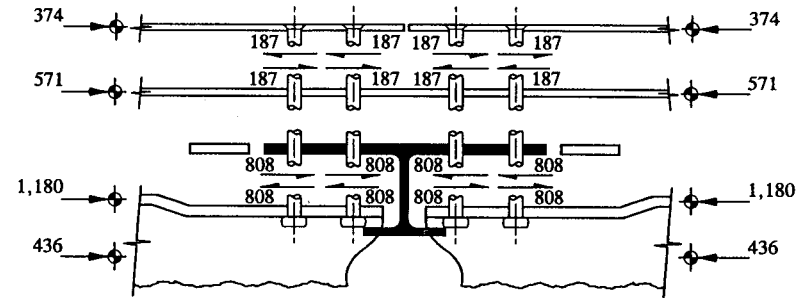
Transfer of shear through the end fasteners of the stringer cutout.
